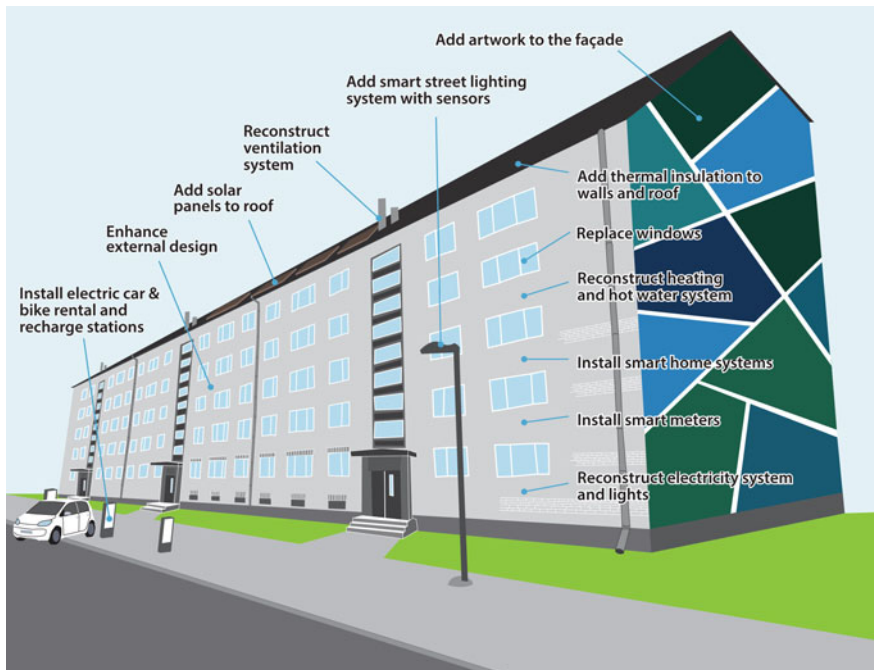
Apartment building renovation plans in the Tartu pilot area: retrofit, mobility improvements and street lighting
